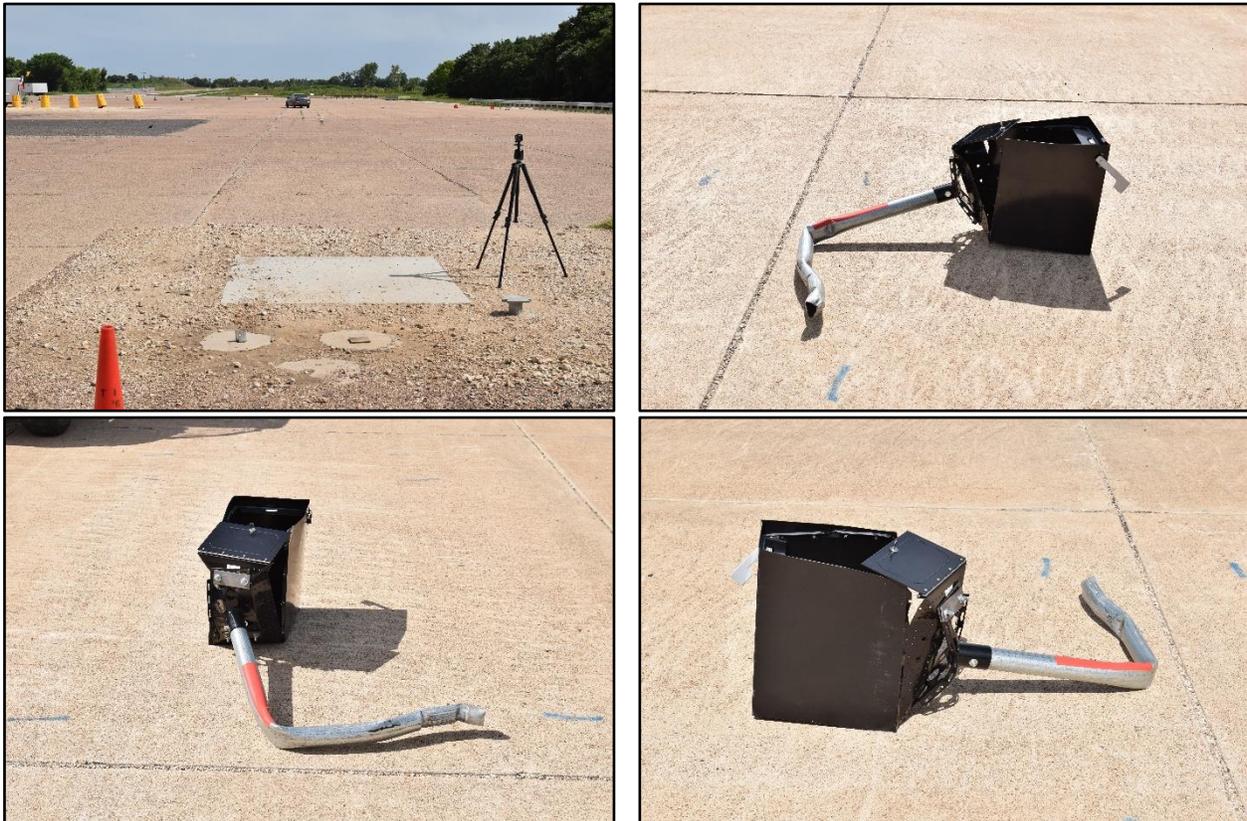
Lockable Mailbox on Thin-Wall Galvanized Tube with Type 2 Foundation after Test No. 469469-10-3.
